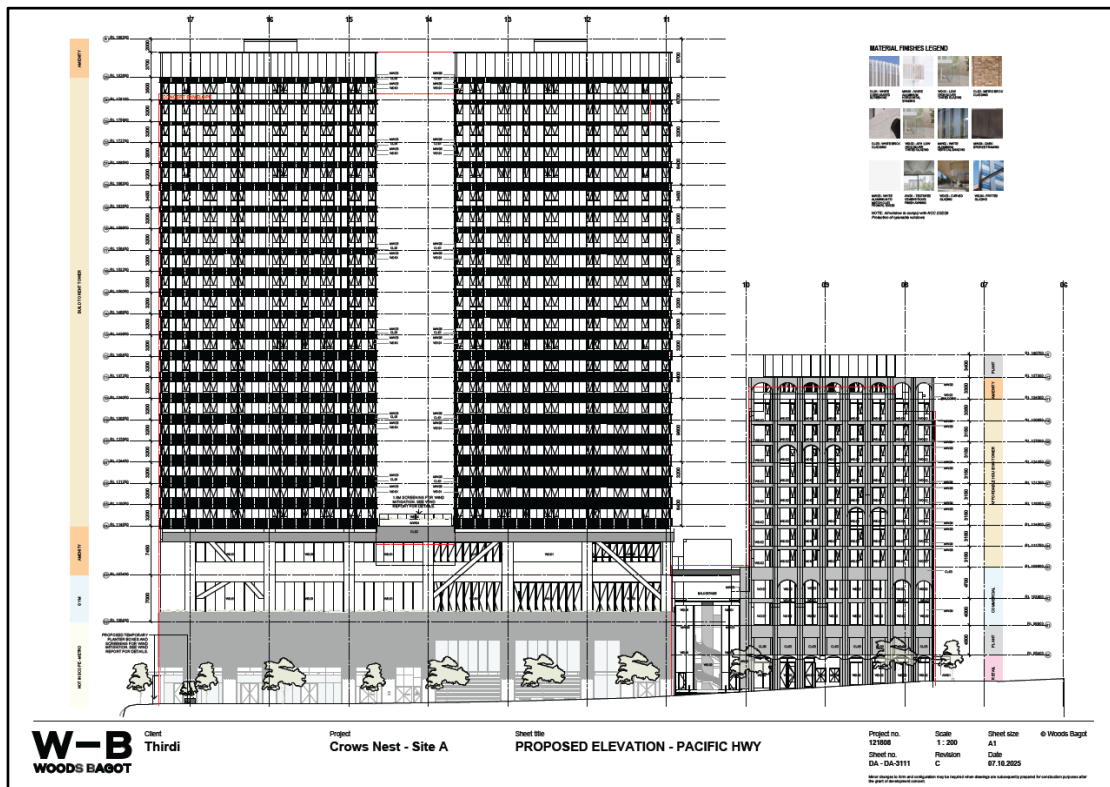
Crows Nest OSD – Site A –Proposed Elevation – Pacific Highway
